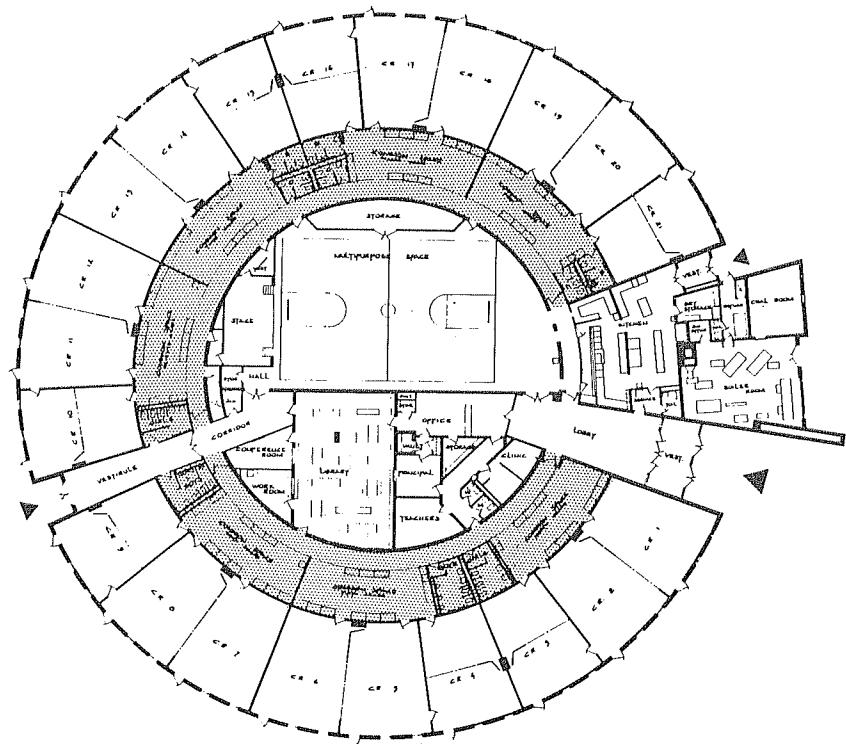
Floor plan of South Salem Elementary School, Salem, Va. The shelter area is located in the inside corridor ring and common-space areas. Shelter was obtained by providing a 6½-inch concrete slab over the inside ring instead of a conventional steel truss system. Additional shielding was obtained by use of masonry corridor walls and exterior walls with minimum window areas in the classrooms. Abovegrade shelter space is available for virtually all of the students.
